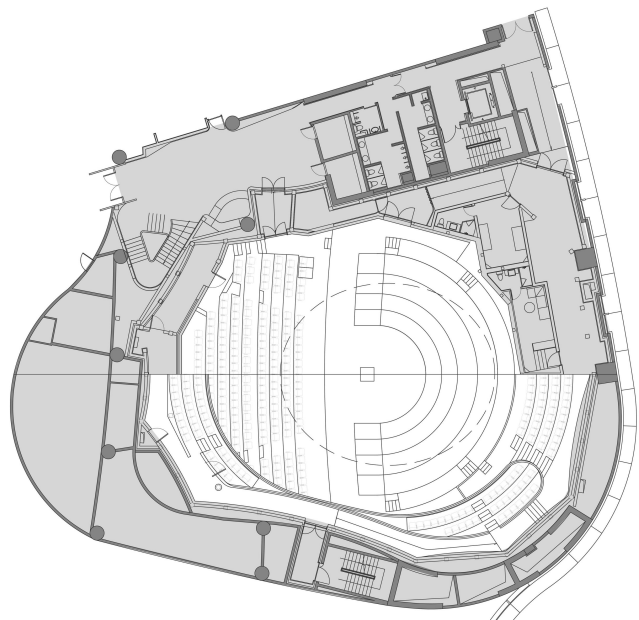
Hall's Main Floor and First Balcony Plan View Drawing
